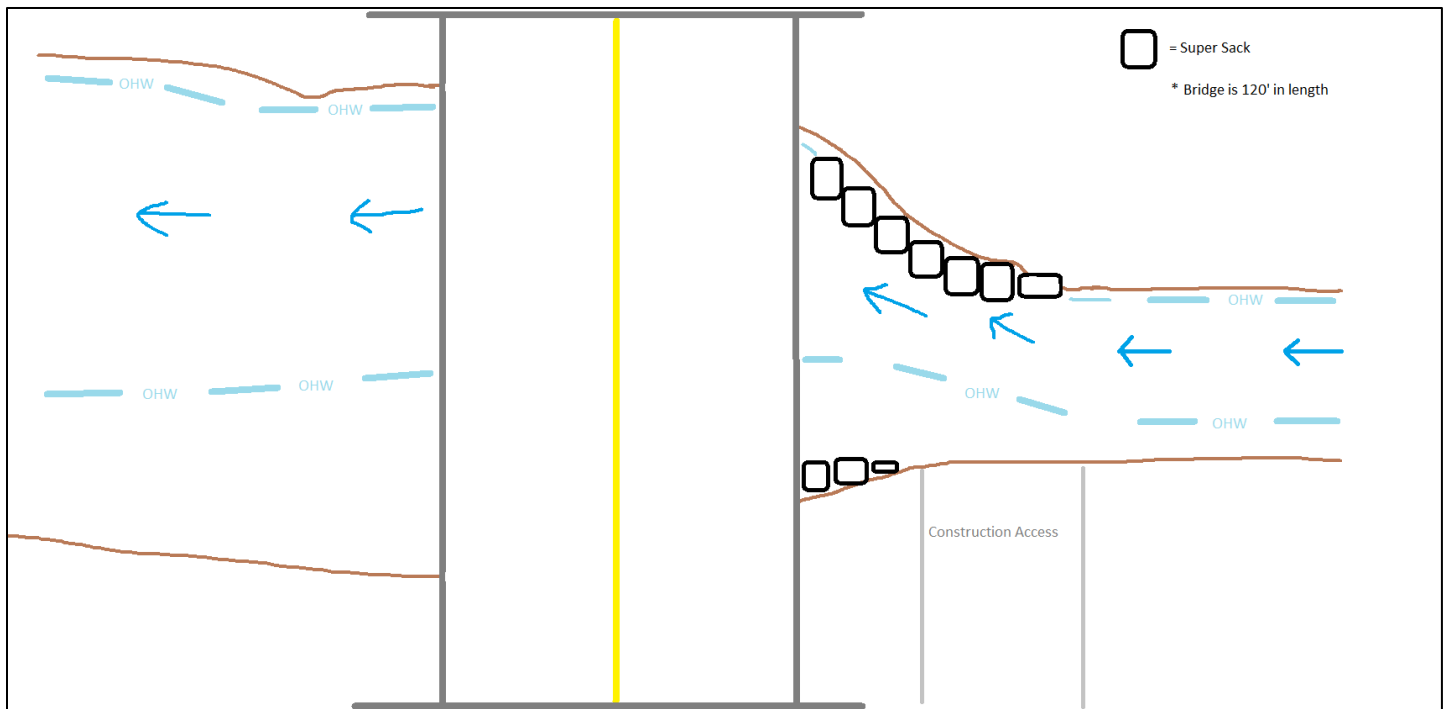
Plan view showing super sack placement, construction access, ordinary high water, thalweg, and bridge.
